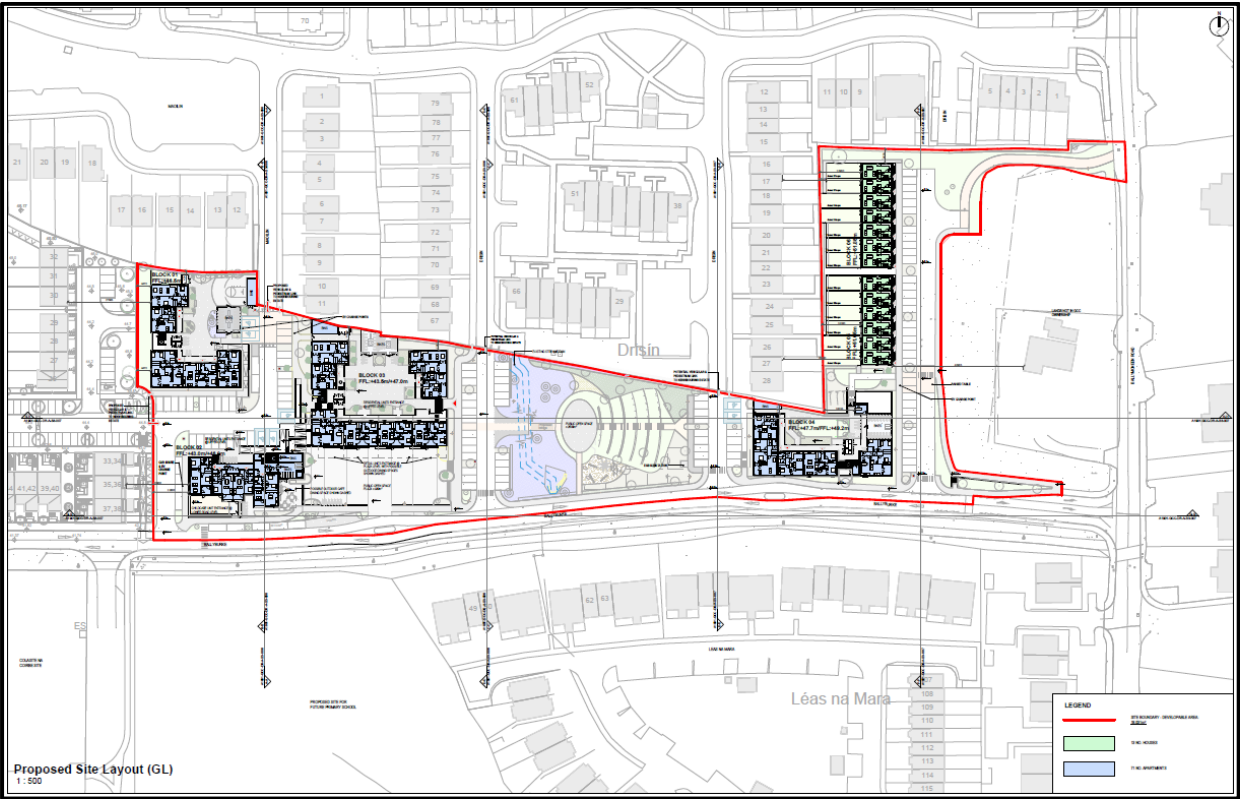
Proposed Site Layout (Source: Galway City Council)
